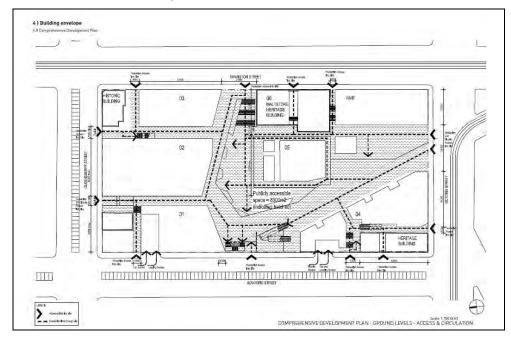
Access & Circulation Plan (Source: Carlton Brewery Masterplan, October 2007)
